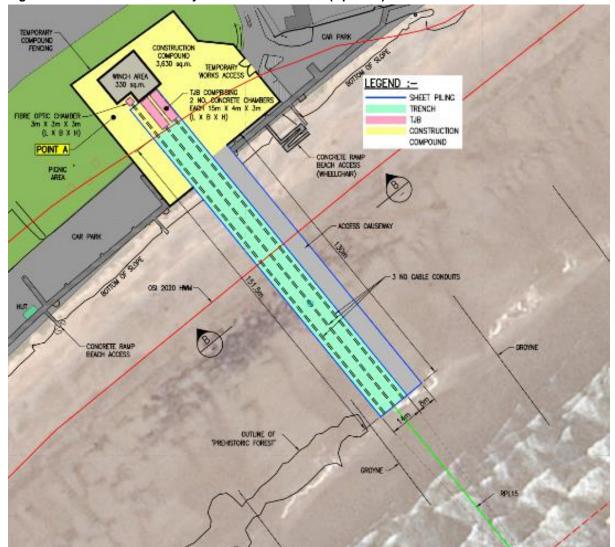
Construction/laydown Area Phase One (Option 1)
